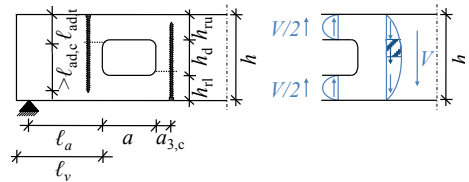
Hole in beam: reinforcement (left) and distribution of shear stresses (right)
